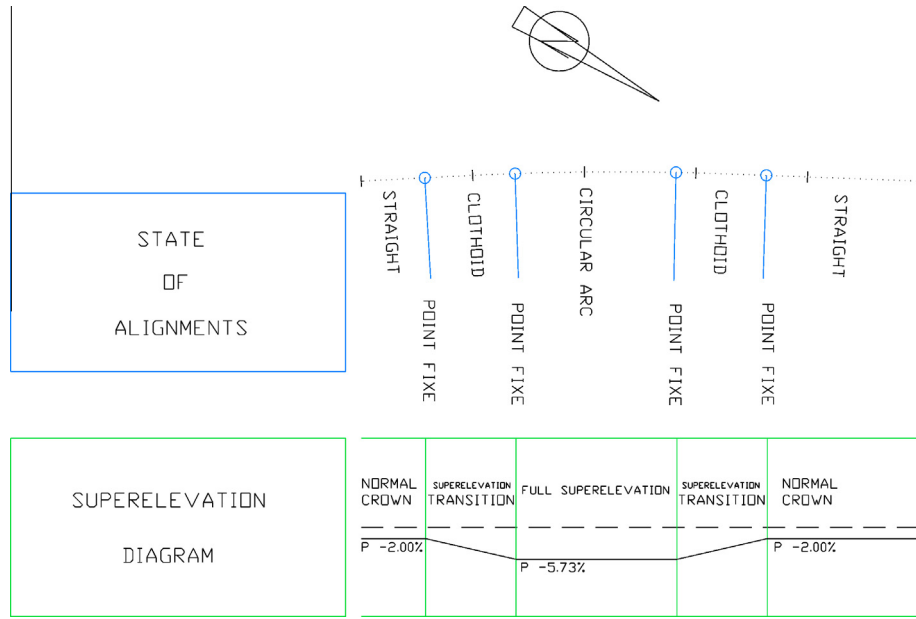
Parameterisation of a road regarding cross-section slopes. Related floor plan of the road (top) and superelevation diagram (bottom) are shown in the diagram.
